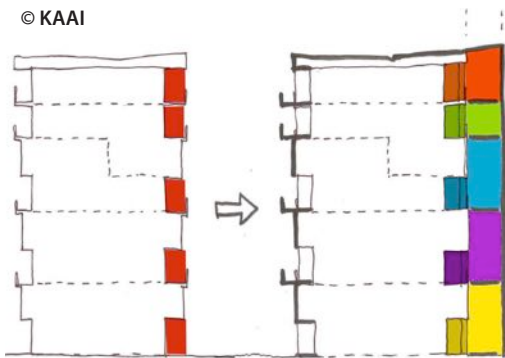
Tove Ditlevsensvej. Construction section through north elevation (1:50)
